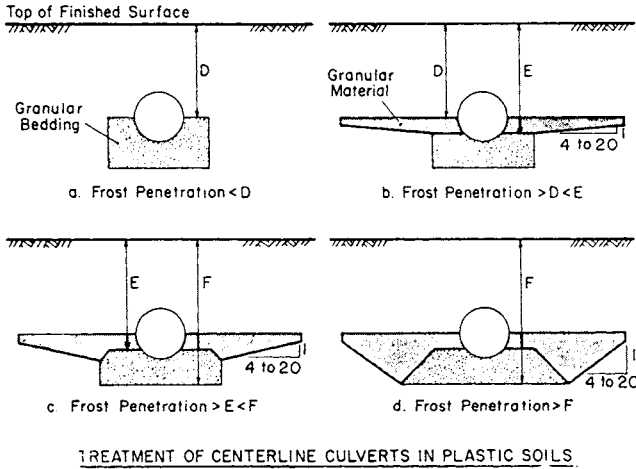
Details for Culvert Installation under Pavements (from U.S. Army 1985)
